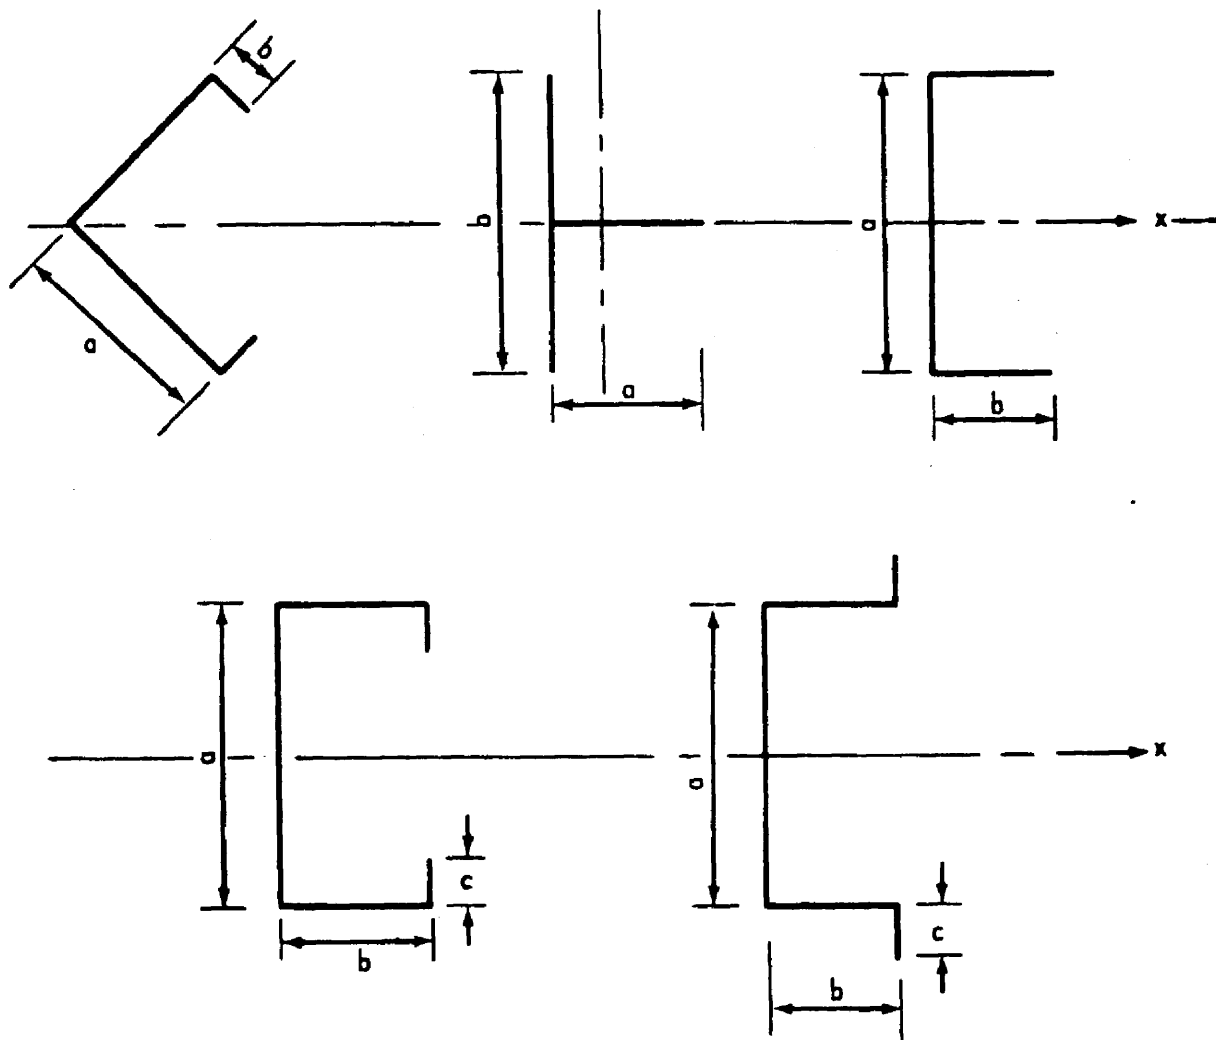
SINGLY SYMMETRICAL SECTIONS
